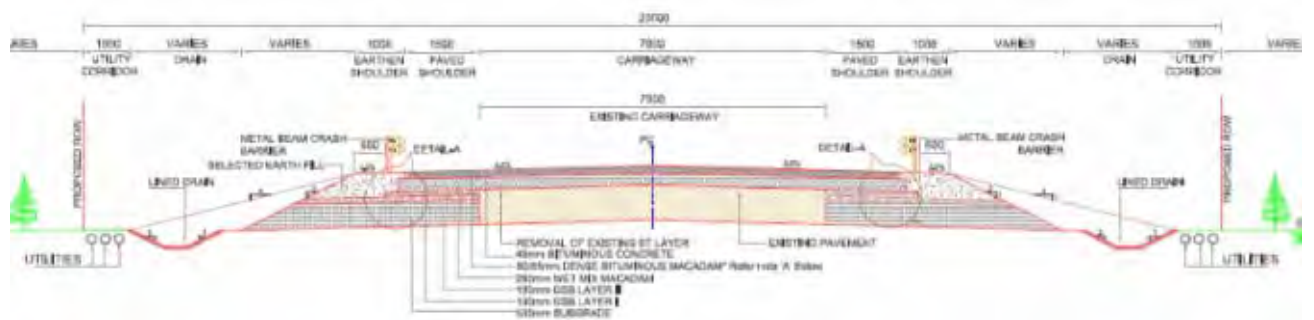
C4-R – P Two Lane Carriageway with Paved Shoulder in Rural Area (Partial Reconstruction)
